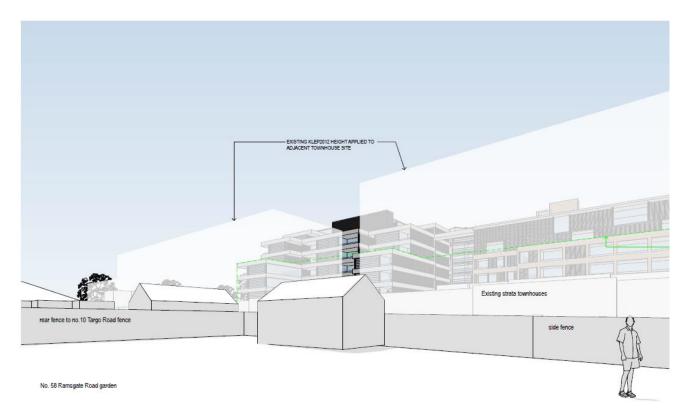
View from No. 58 Ramsgate Road Private Outdoor Space
